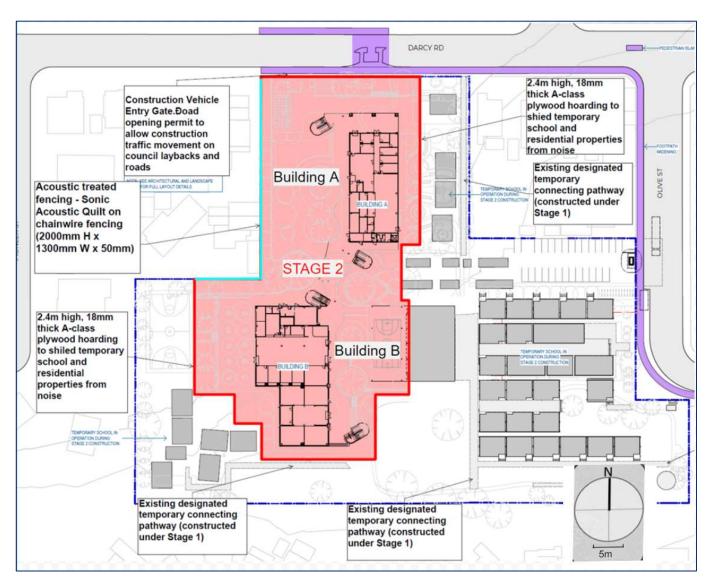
| Stage 2 layout (Base source: Applicant's RtS 2023)
